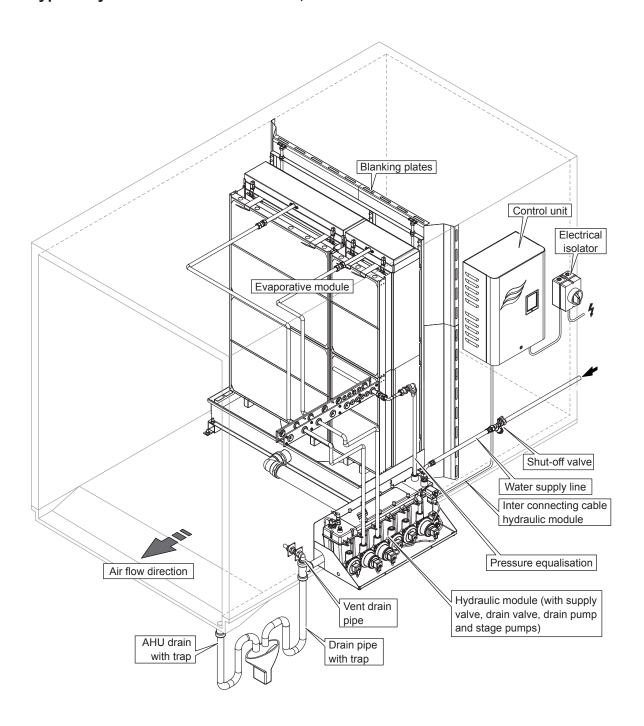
Typical system Condair ME Control, external install with centre drain tank
